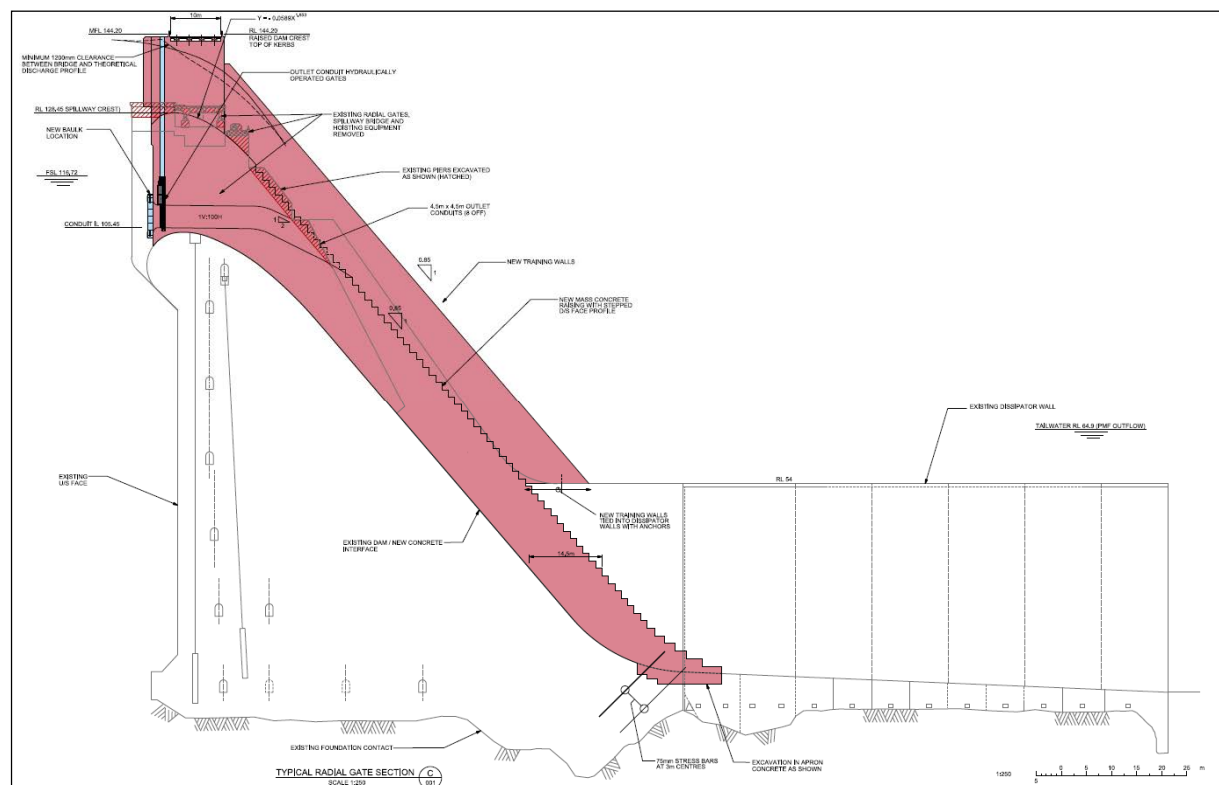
Cross section of a 14-metre raised Warragamba Dam showing buttressed spillway with a stepped face and raised training wall
